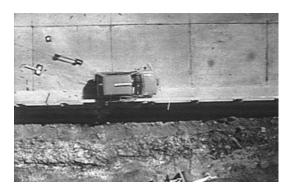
Sequential photographs for test 404531-1 (overhead and frontal views).
